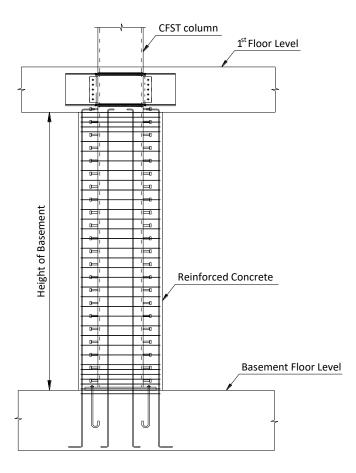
Concrete encased concrete filled steel tubular column at basement
